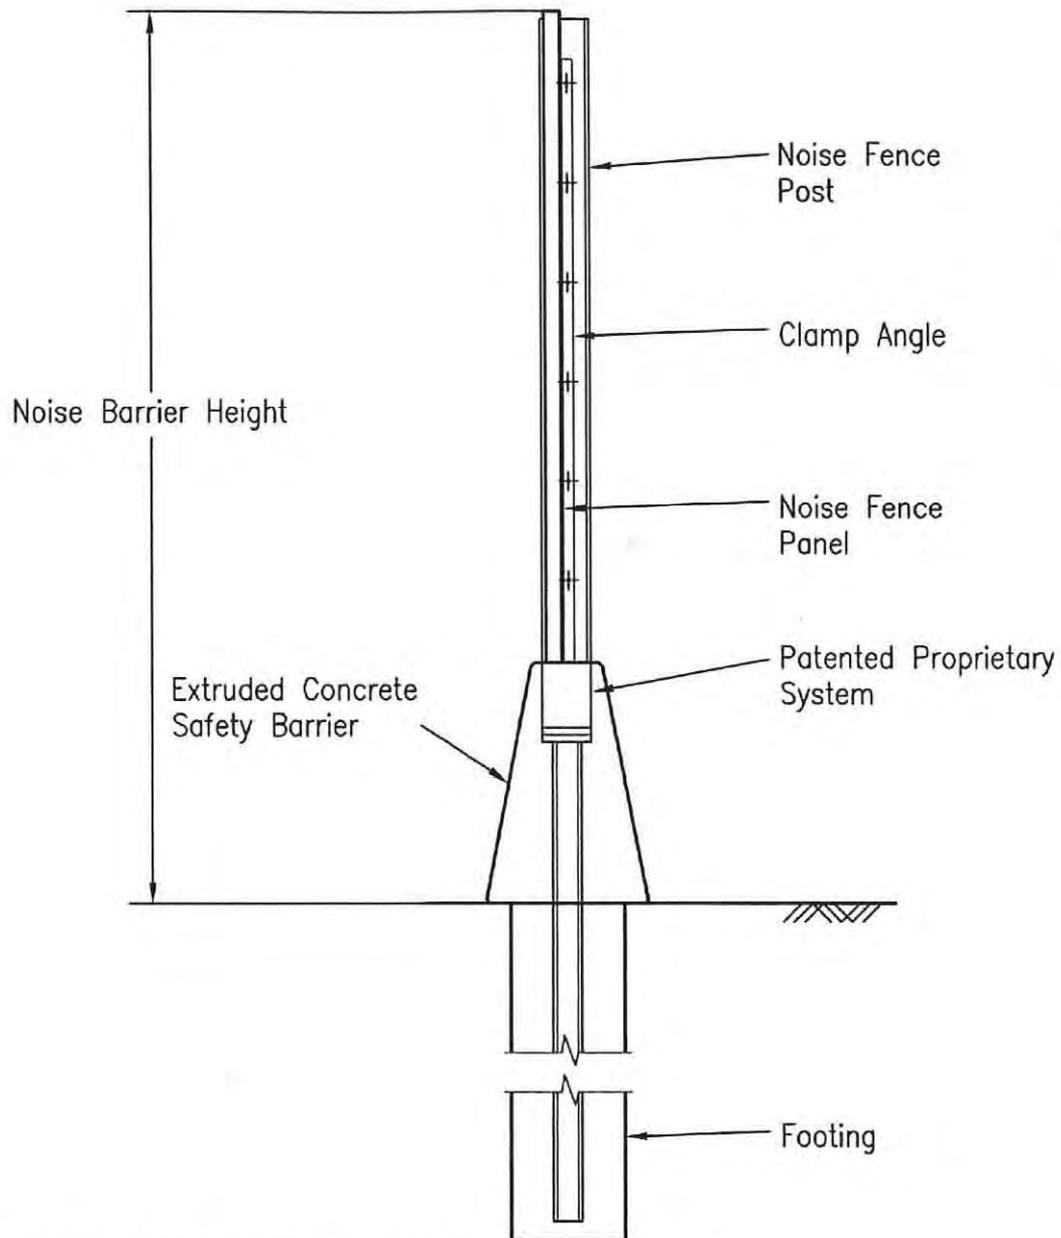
(d) Option D – Extruded Concrete Safety Barrier
